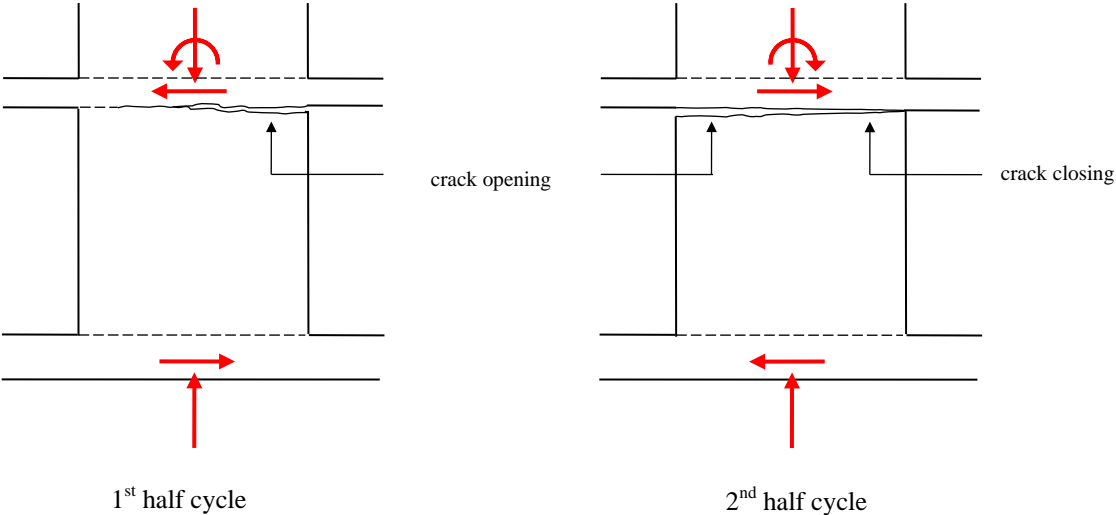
Crack opening process at the joint between the structural wall and the ceiling plate under reversed cyclic loading
